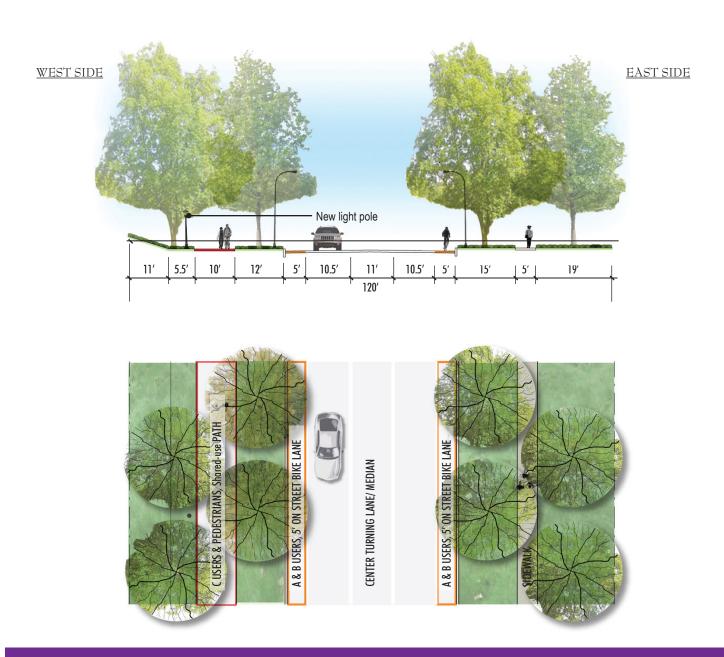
Southwestern Parkway: Zone 1 Prototypical Section & Plan - Shawnee Park to Chickasaw Park
